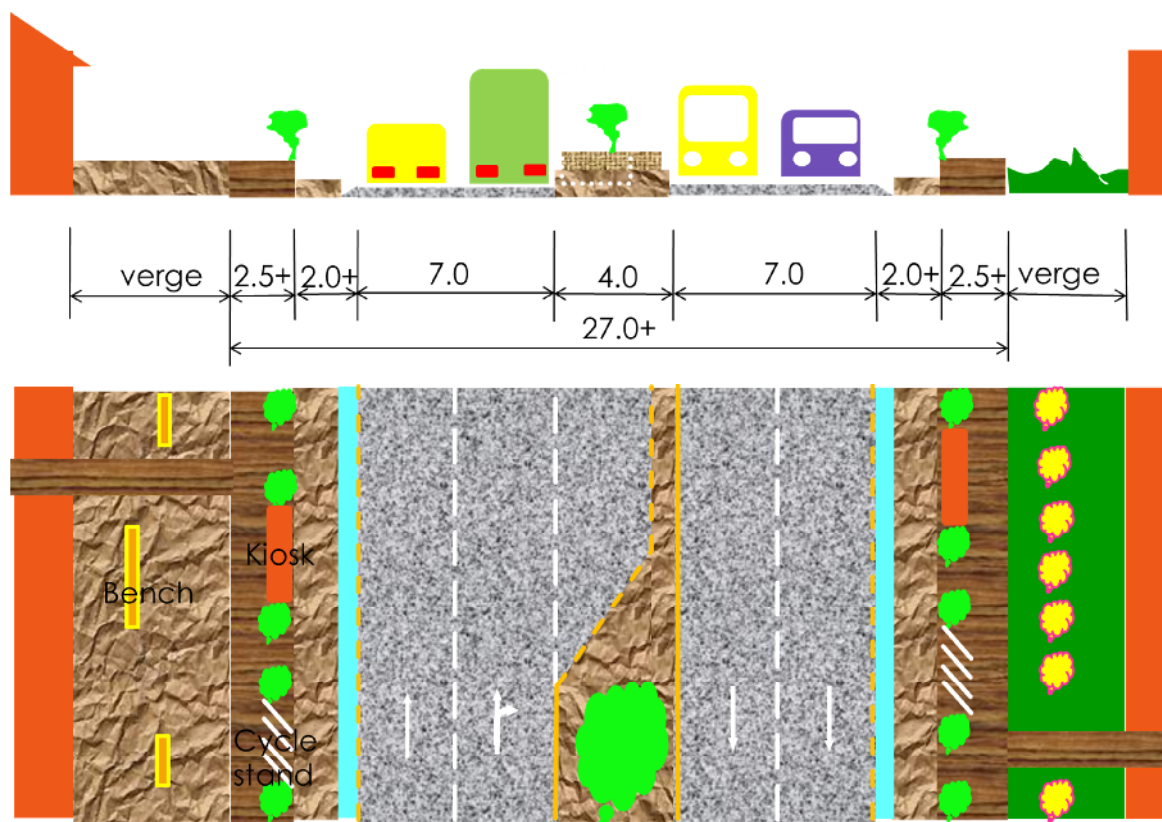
Typical Path with median strip (to be trimmed to provide deceleration lane) and additional space
